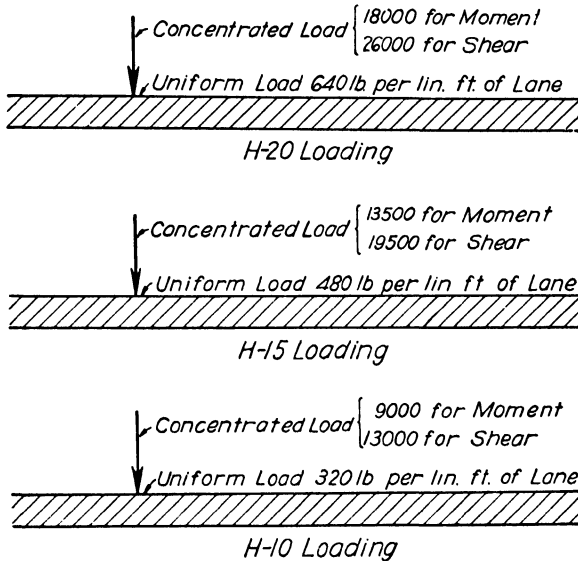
SIMPLIFIED DESIGN LOADINGS.
